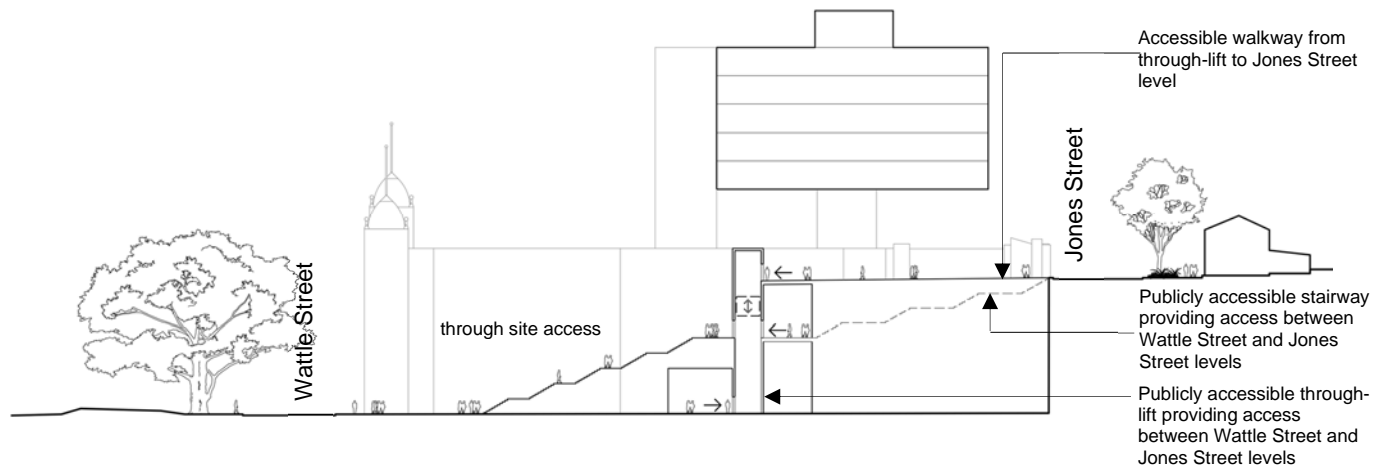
cross section of through-site access for 28-48 Wattle Street
